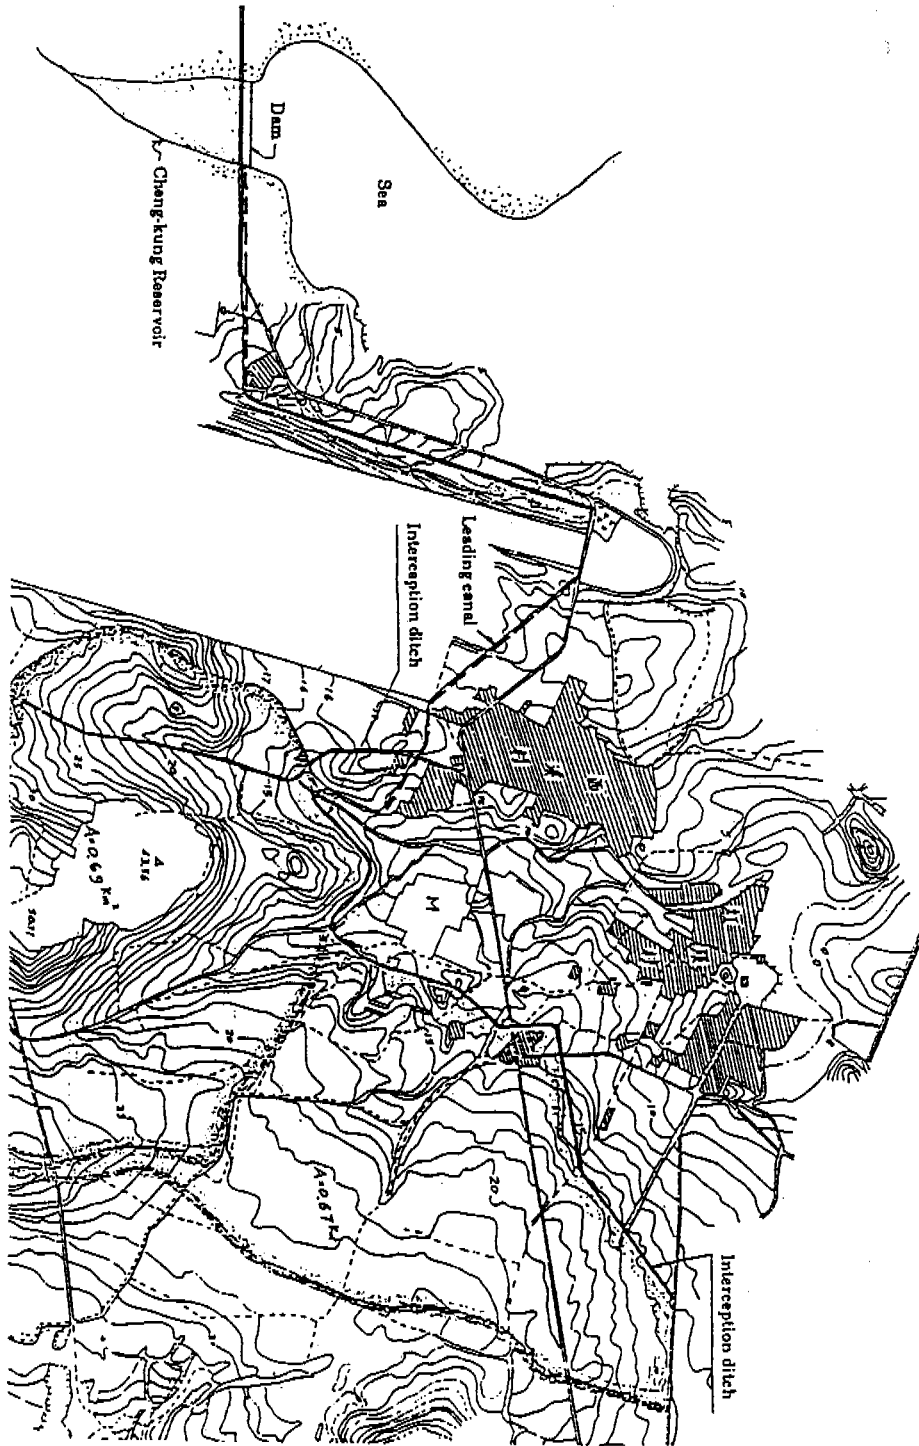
Engineering Layout of the Hong-lo Transbasin Rainwater Harvesting Works
